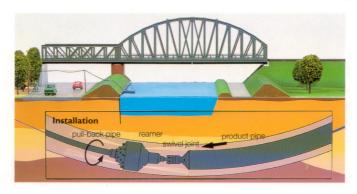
Example of how directional drilling is carried out (Courtesy of LMR Drilling UK Ltd)
